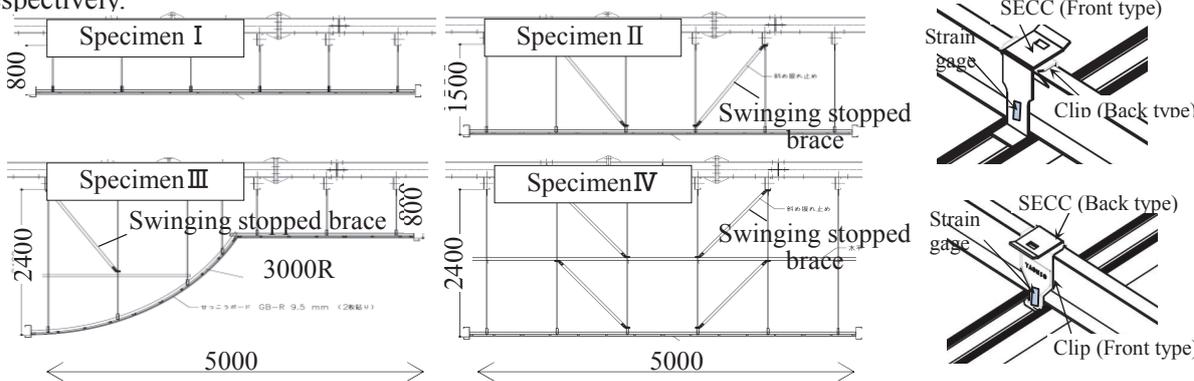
Elevation of the metal furring suspended ceiling specimens (unit: mm)
